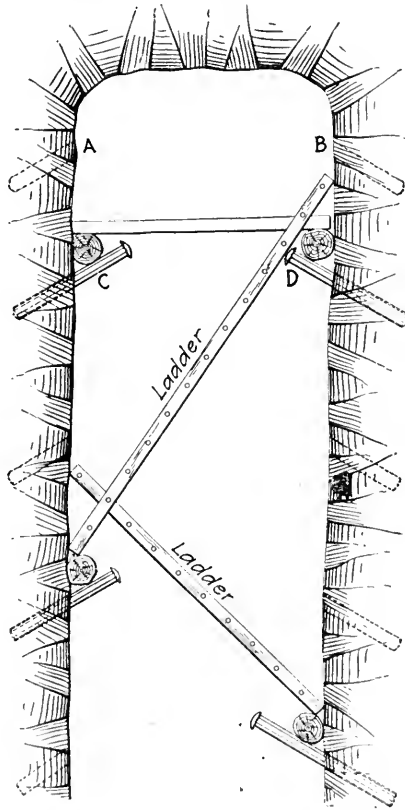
SCAFFOLD AND LADDERS SUPPORTED ON DRILL STEEL.
